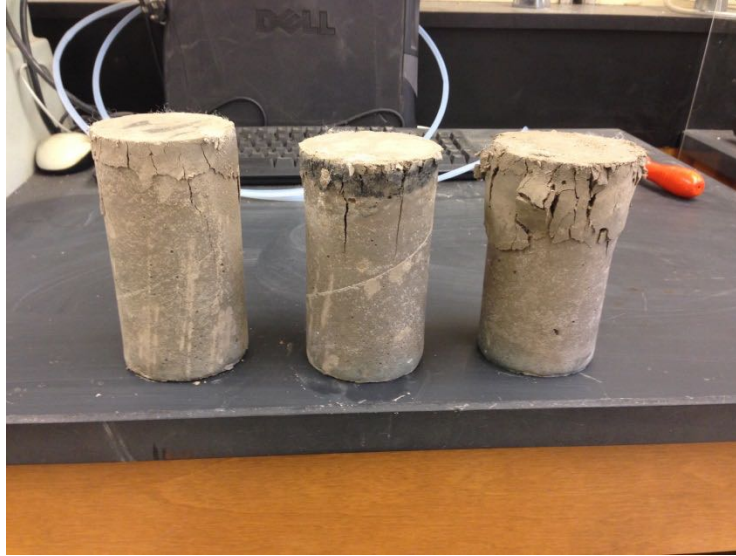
EBF-B paste after UCS testing showed cracks but the broken pieces remained attached to the cylinder
